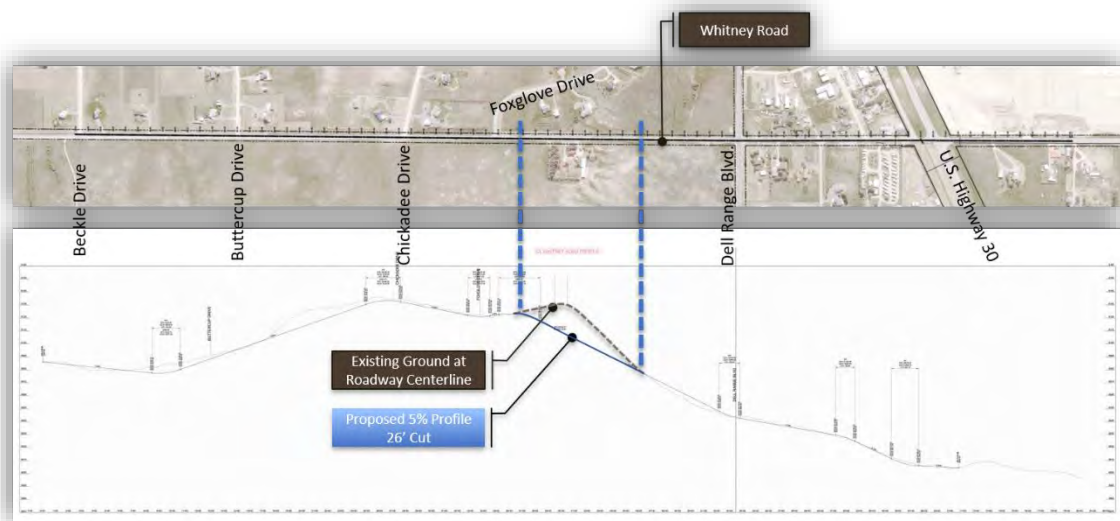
Existing and Proposed Profile Concept Whitney Road
